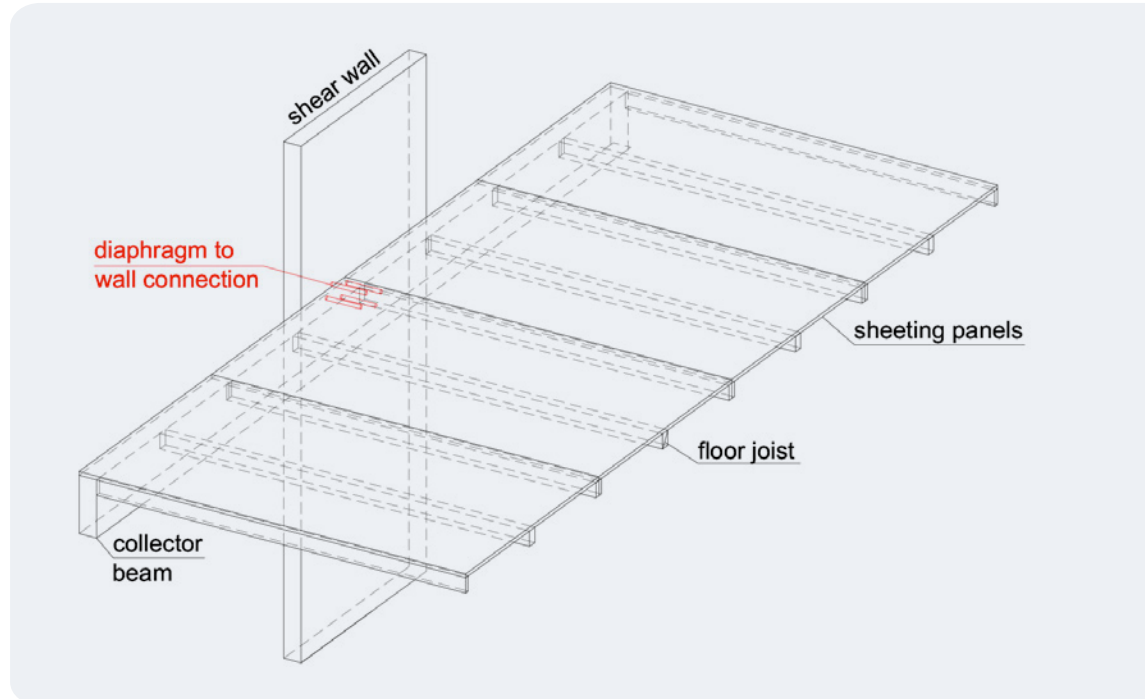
Scheme of a typical diaphragm-to-wall connection.
